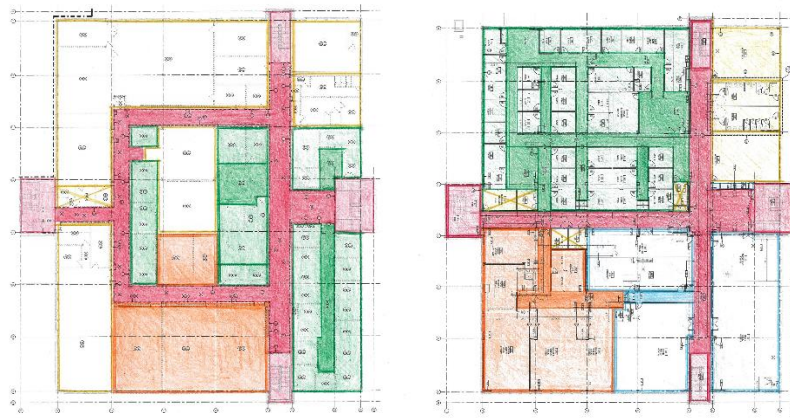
Floor plan of the space assessed, before (left) and after (right) the renovation.
